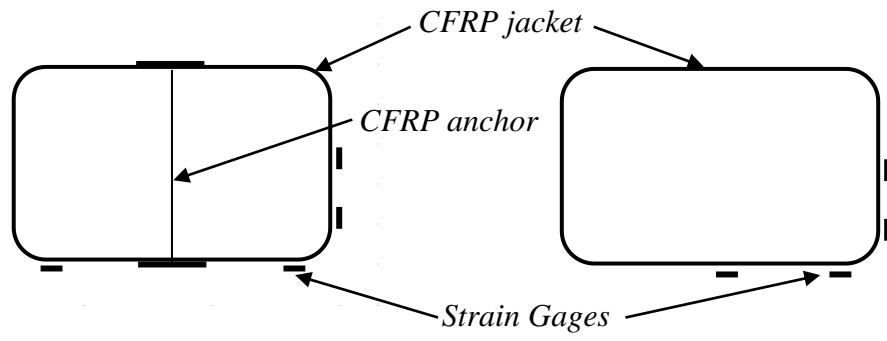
Strain gauge configurations on cross section at specimen midheight
